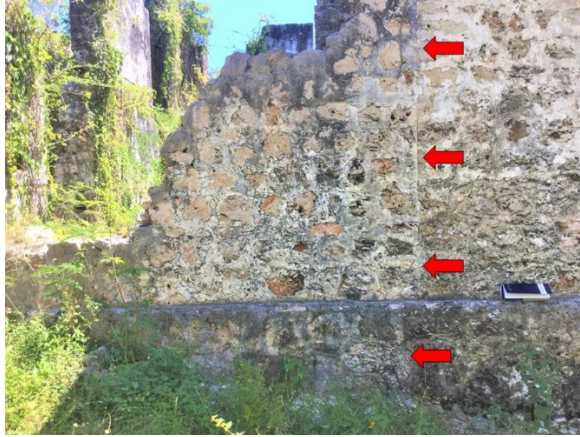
Seam #1 (left) and Seam #2 (right) located on western exterior wall of Great House.
